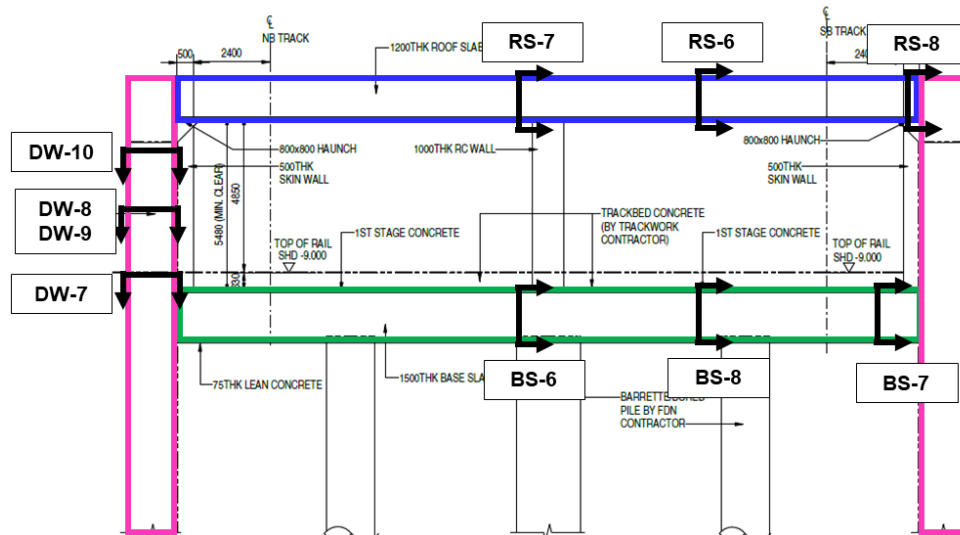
Location of design sections in C717 Cut-and-Cover Overrun Tunnel
